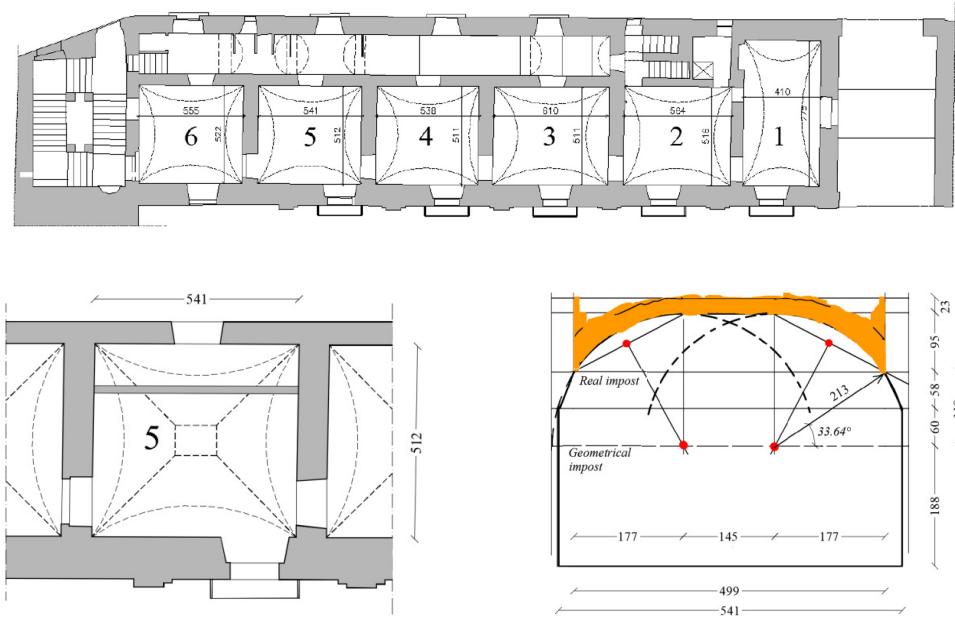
Main facade of the ground floor plan with vaulted structures (top), particular of analyzed cloister vault plan (bottom left) and its longitudinal section (bottom right).
